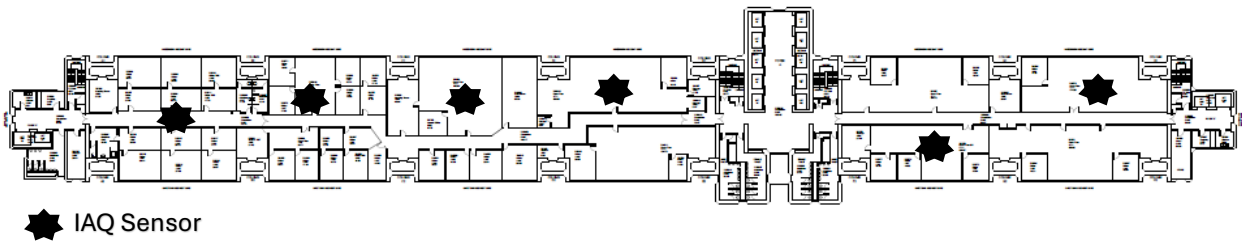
Tower Building proposed sensor positioning 21st floor (6).
